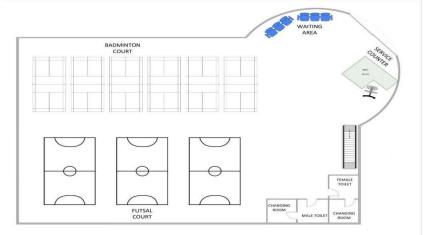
The proposed floor plan (6th floor) of Pandan Safari Lagoon Waterpark Source: Researchers (2024)
